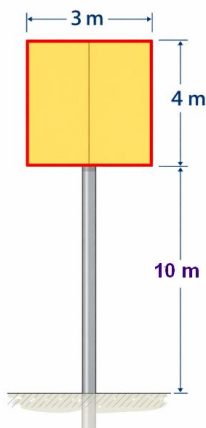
Geometry and dimensions of freestanding billboard sign
